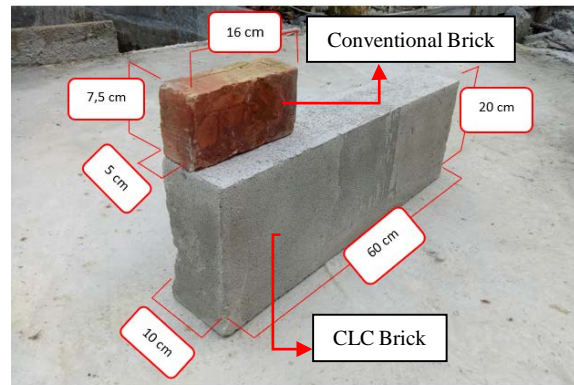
Dimension of conventional and Cellular Lightweight Concrete (CLC)
